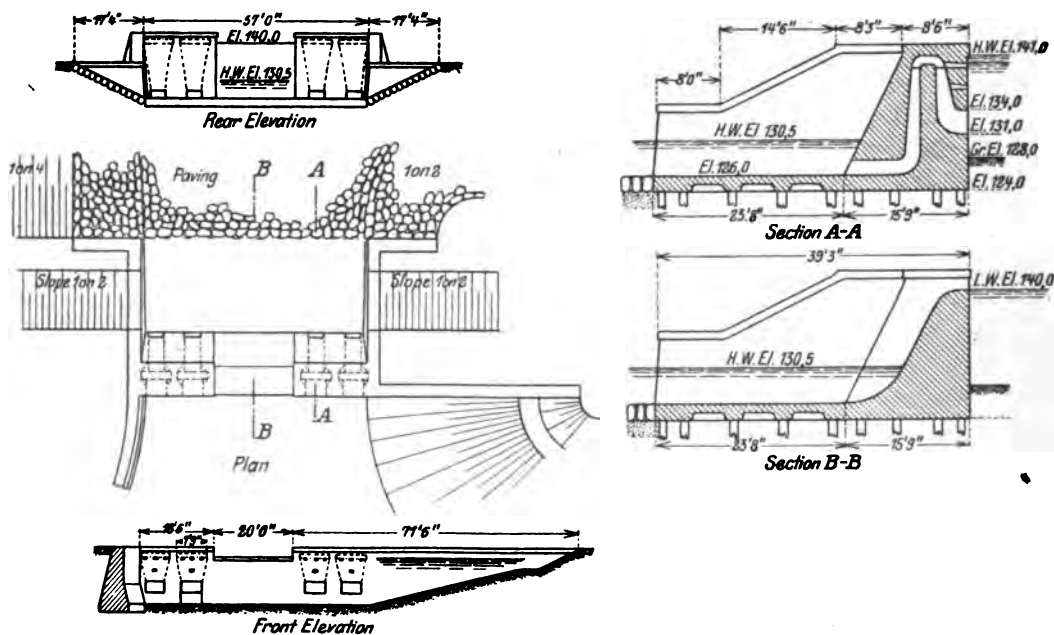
/115. Details of Siphon Spillway at Lock No. 9. Champlain Canal.
